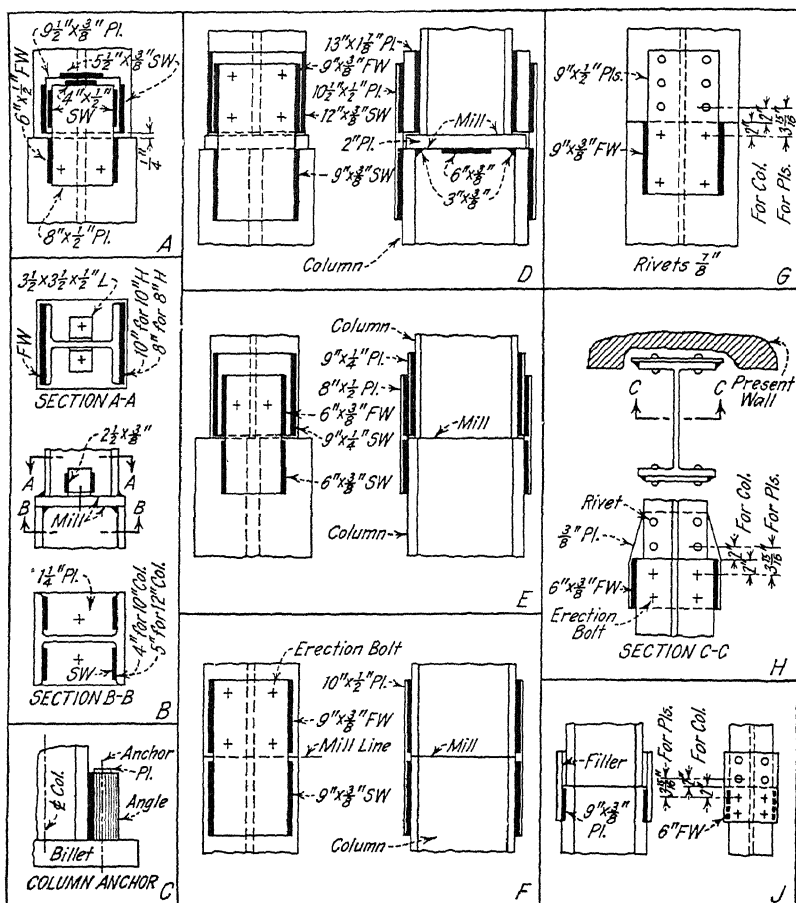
Structural Details. Sketches of Column Splices in All-Welded and in Shop-Riveted, Field-Welded Buildings.
